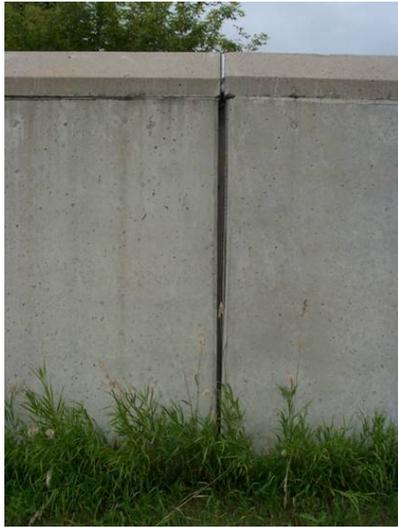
MINIMALLY ACCEPTABLE floodwall. Monolith joint separation caused by settlement, no landward or riverward tilting. The opening is about 3 inches wide at the top but the rubber joint sealer is still intact and undamaged. This joint has since been repaired by bolting another joint sealer on the both sides of the wall and filling the void with an expandable joint sealer. (ND)
